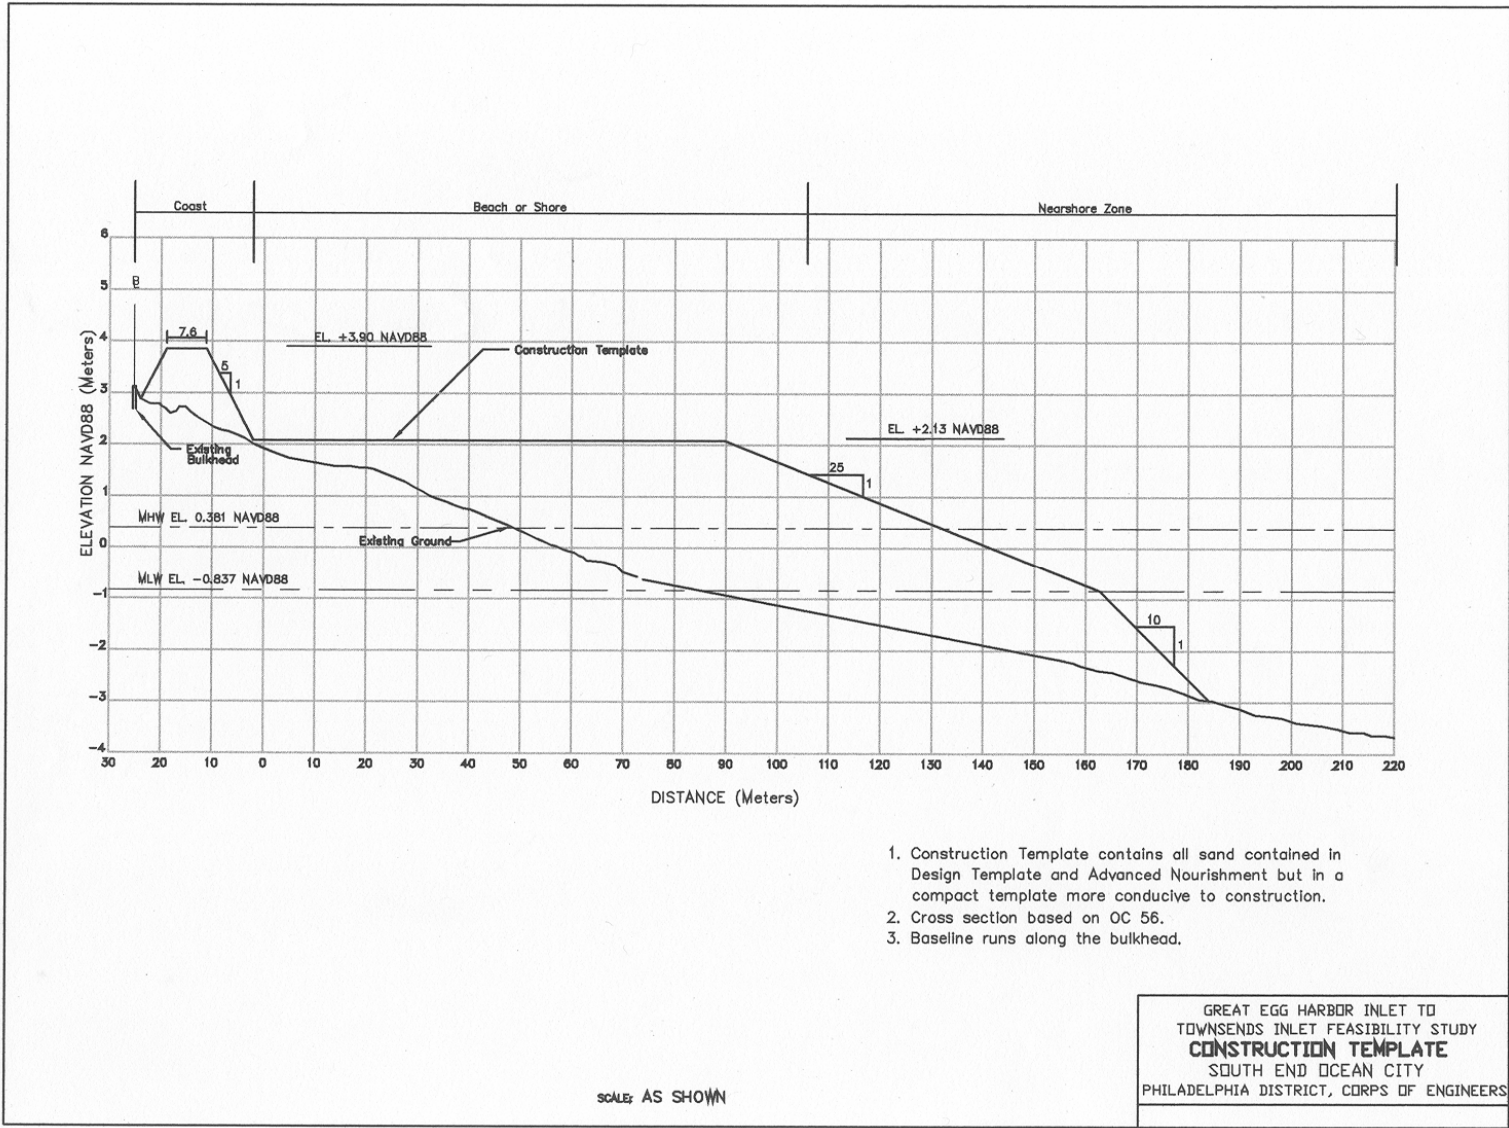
Selected Plan for Ocean City, NJ - Typical Construction Cross Section, 34th – 59th Street
